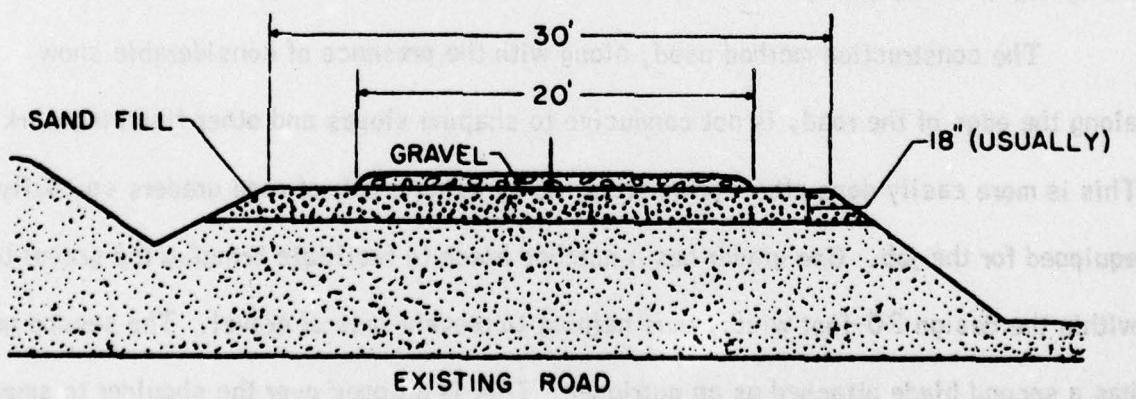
Typical Section for Winter Fill Construction in Ontonagon County, Michigan
